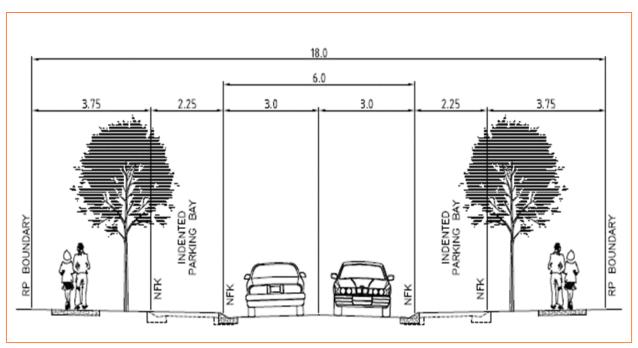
Council Typical Example – Neighbourhood Road (City Plan – BSD1021)
